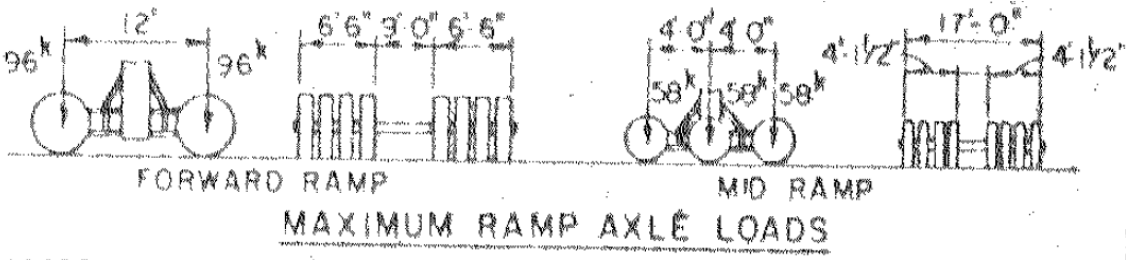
Roll-on Roll-off Ramp Axle Loads
